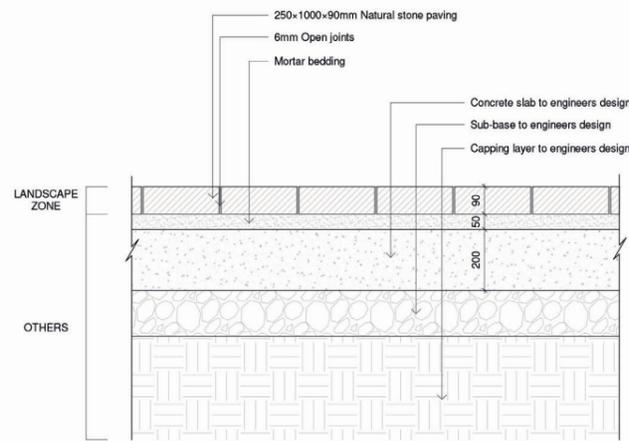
COURTYARD STONE PAVING TYPICAL DETAIL
